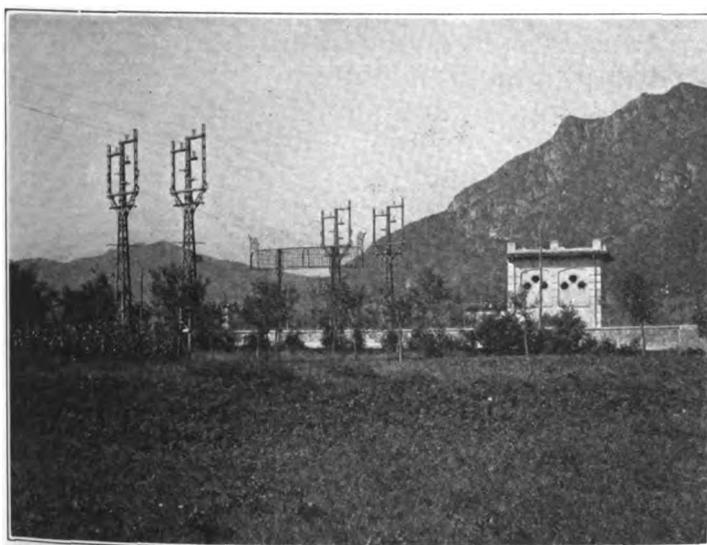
STREET AND TELEPHONE CROSSING NEAR LECCO; ALSO SECTION SWITCH HOUSE.
